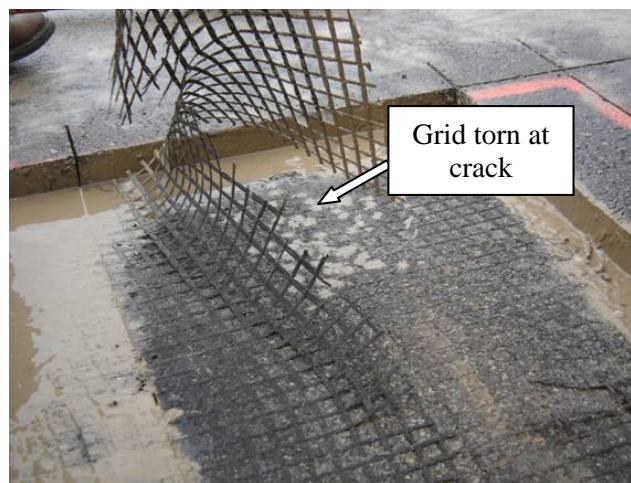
Photograph of a Trench at a Transverse Crack on US 175.
